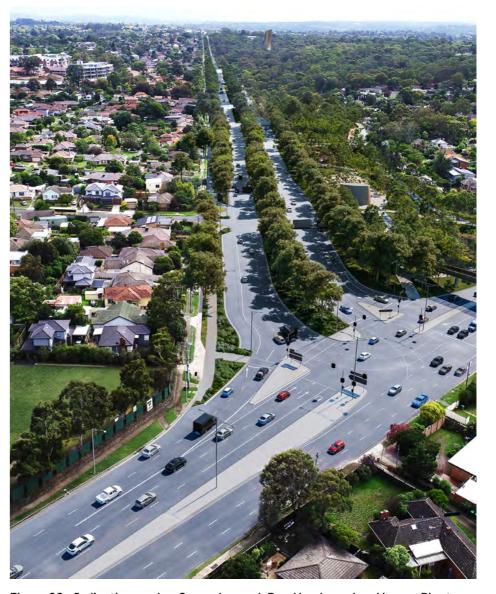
Indicative render: Greensborough Road boulevard and Lower Plenty Road interchange
